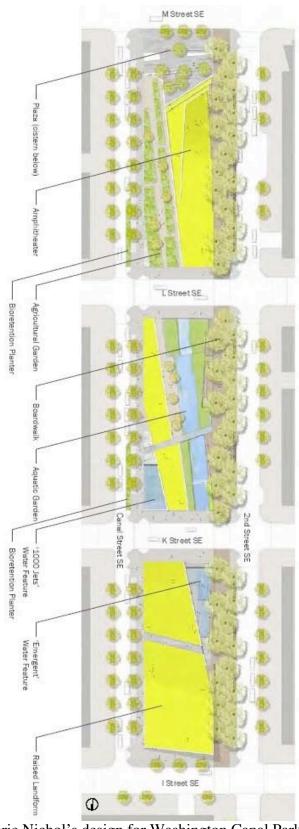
Gustafson Guthrie Nichol's design for Washington Canal Park, Washington, DC ("Canal Park Design")
